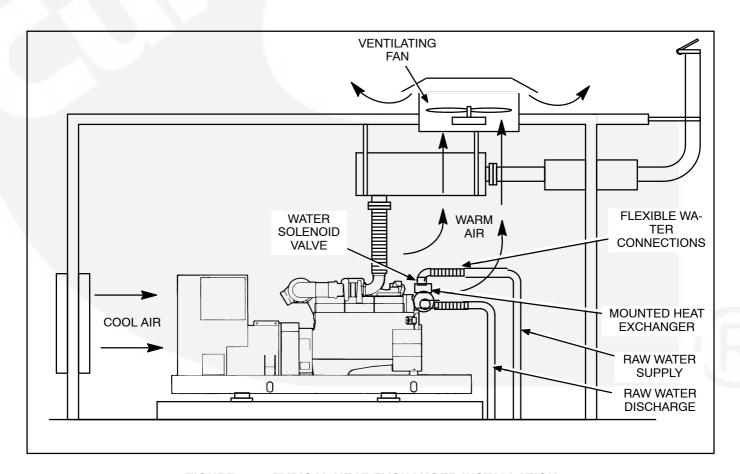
TYPICAL HEAT EXCHANGER INSTALLATION
